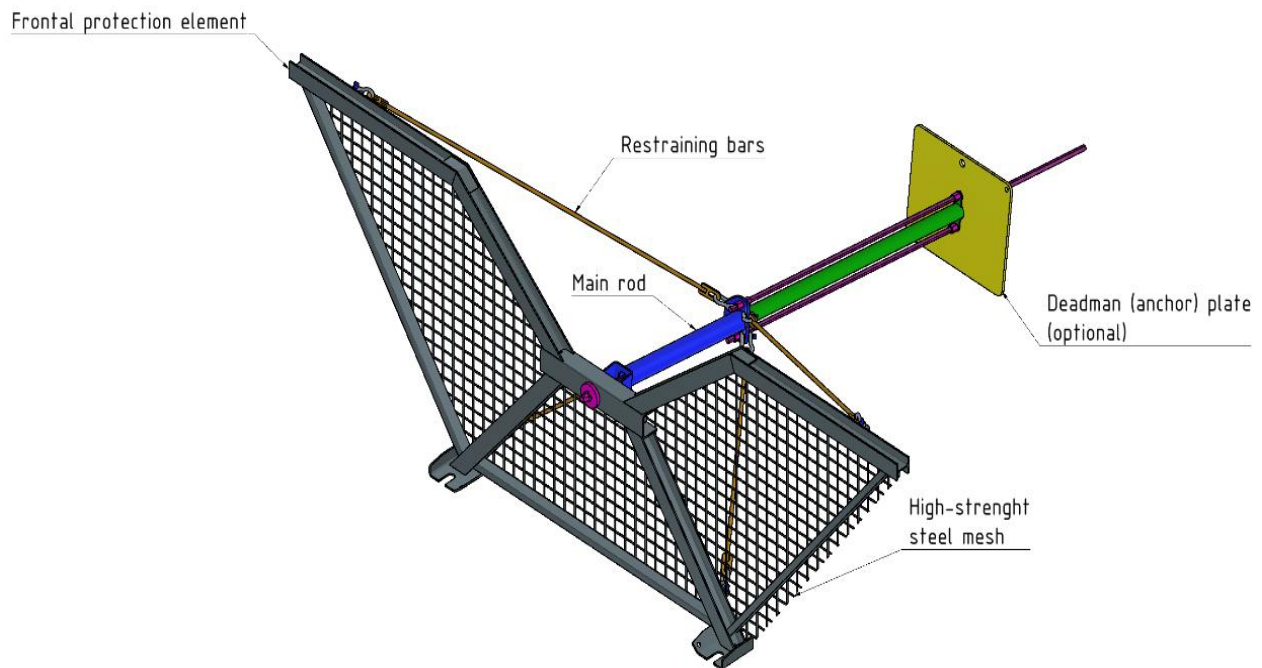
High load bearing earth retaining structures of trapezoid shape for stabilisation of torrent beds
